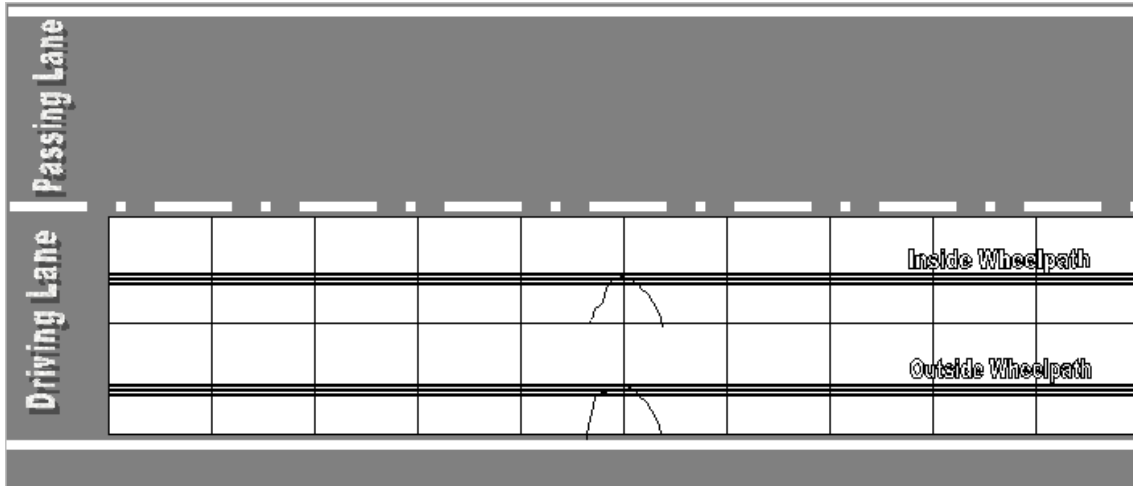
Typical distress patterns that developed at the 6 ft x 6 ft Main Street test intersection. (Vandenbossche, 2003)
